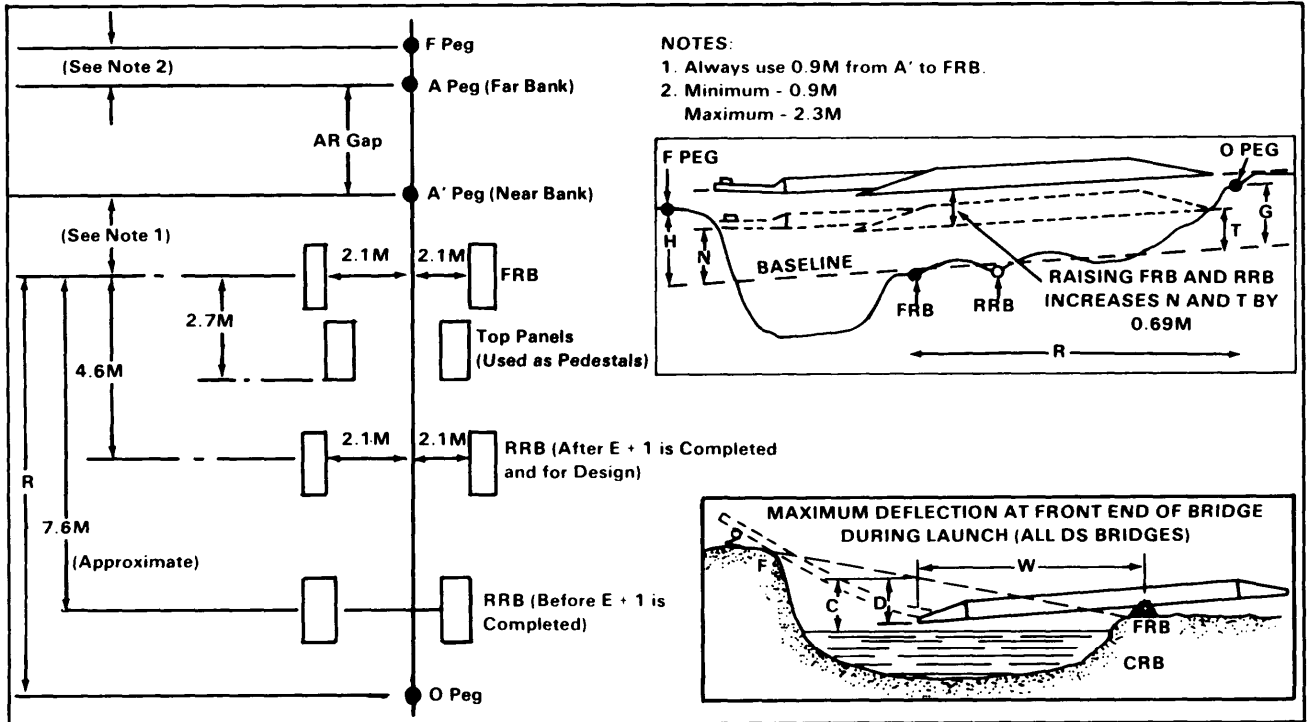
Double story MGB site layout (2E+1 through 2E+12 bays)
